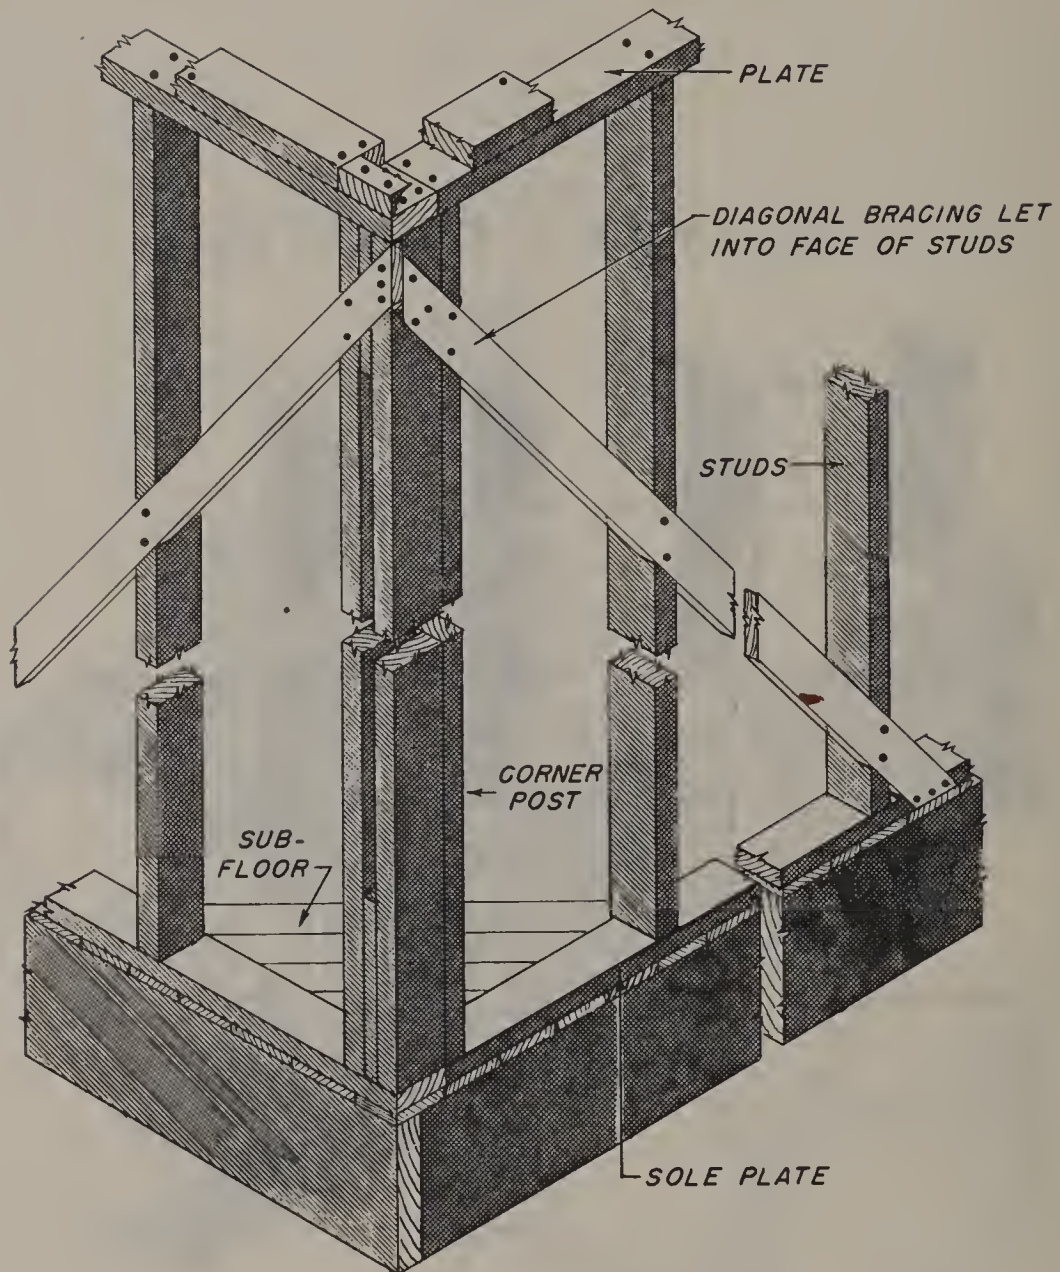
Top plate and let-in bracing. Lower part of plate nailed to each stud and corner post with two sixteenpenny nails. Upper part nailed to lower with tenpenny nails, two near the ends of each piece, others staggered 16 inches. Braces fitted into notches in faces of frame members (including fire stops or headers) and nailed at each crossing stud with not less than two tenpenny nails, and at ends with three tenpenny nails. Note: When window or door openings near corners interfere with placing braces at corners, braces may be placed in other available wall spaces and nailed to top and bottom plates and to studs. At least two braces in each wall are desirable at opposite inclinations and approximately 45° to the horizontal. When sheathing boards are placed diagonally, figure 32, or plywood is used as sheathing, figure 34, let-in bracing is not necessary.
